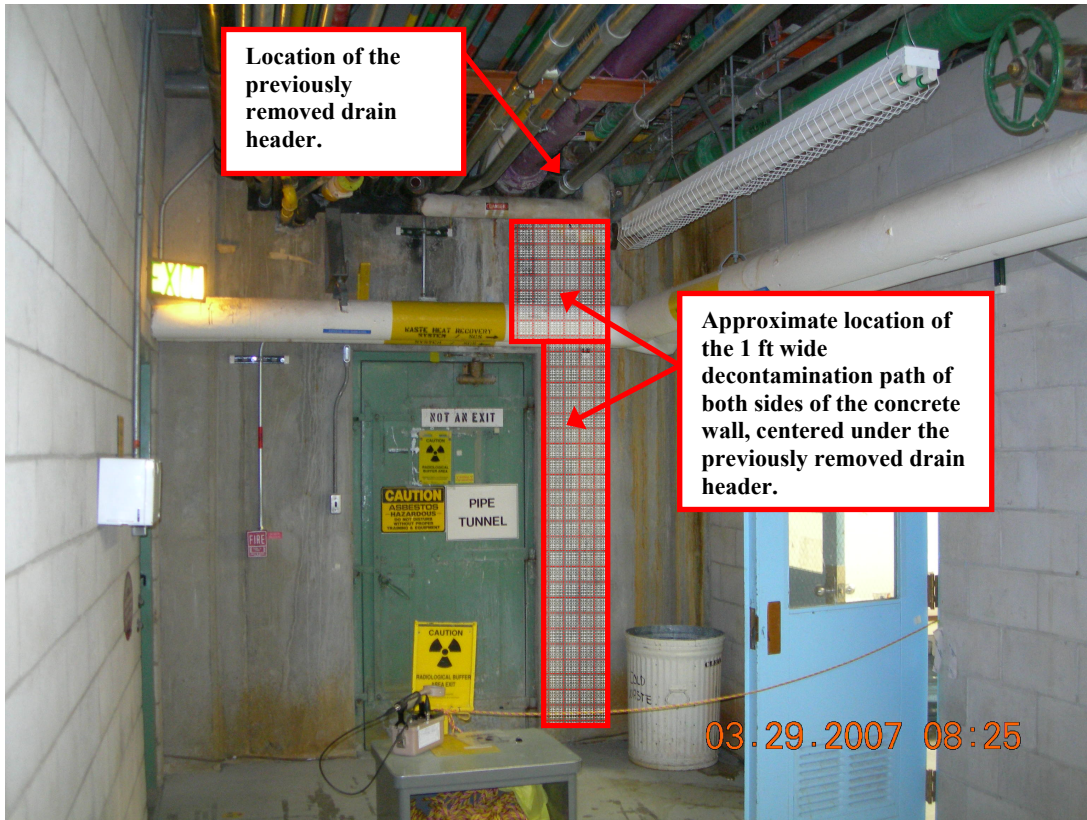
The wall between the TRA-661 pipe tunnel and the TRA-604 basement. Photo was taken from the TRA-604 basement.
